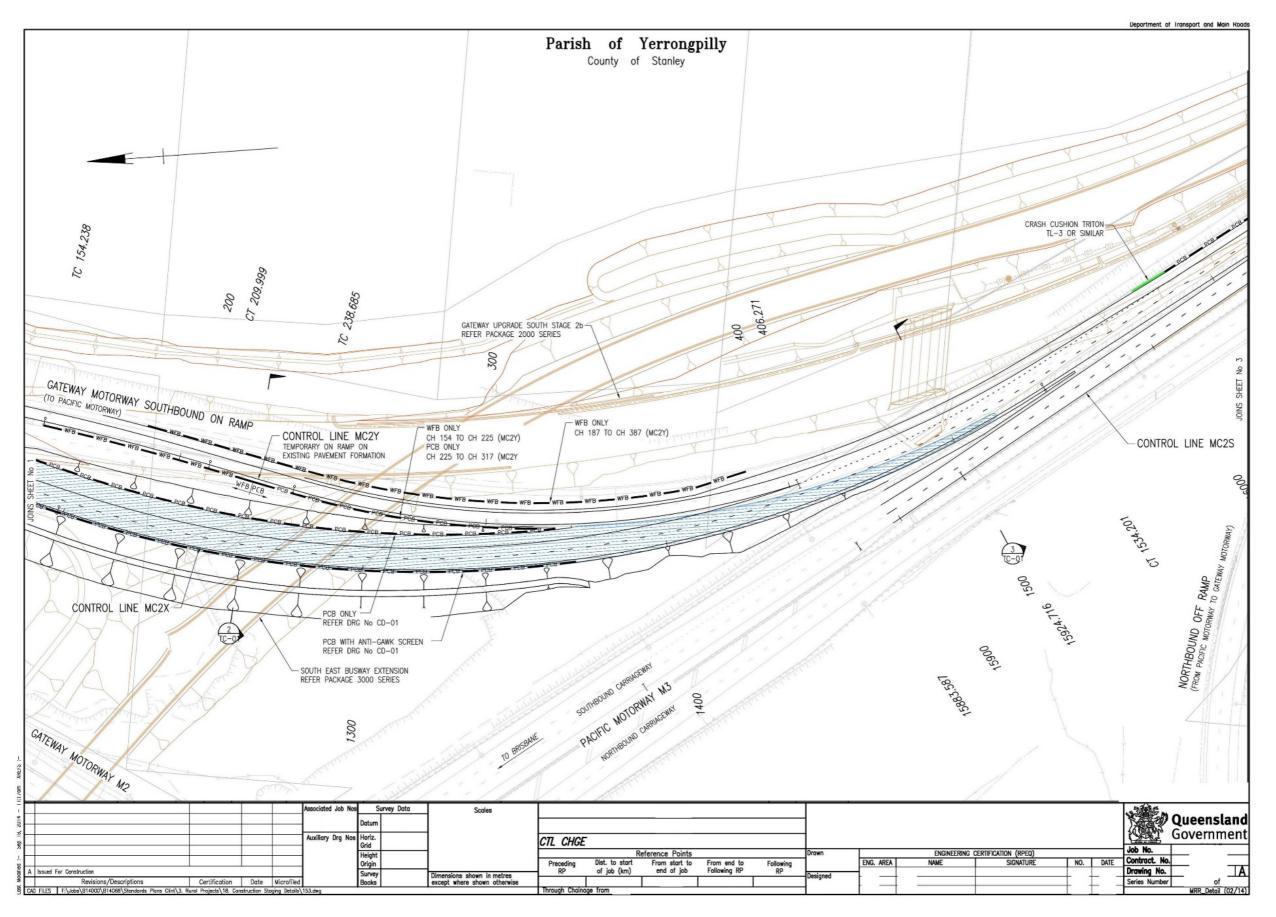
(d) – Construction staging – generic example 2 – sheet 2 of 2
